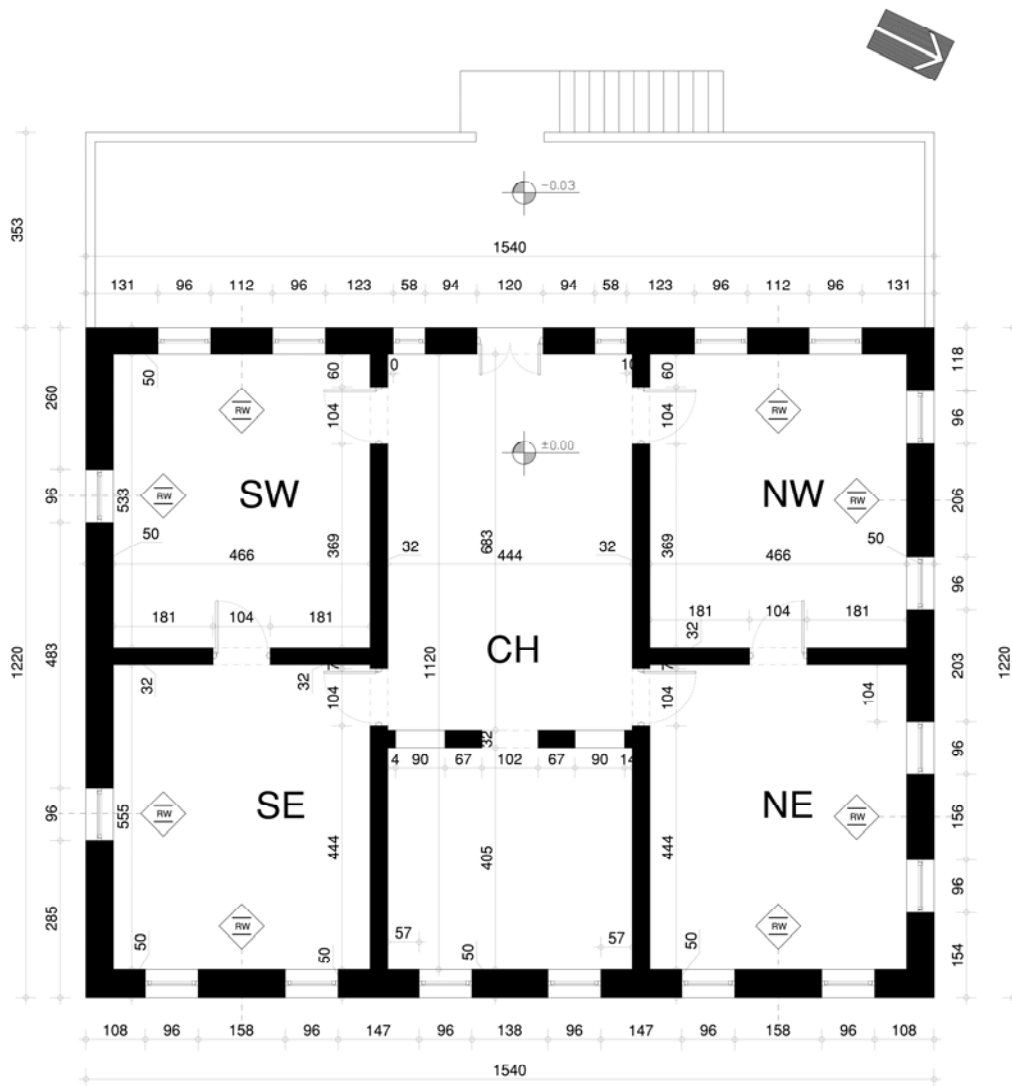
living floor plan of the house at 30 Chelouche Street, Tel-Aviv-Jaffa (redrawn by the author based on existing documentation)
